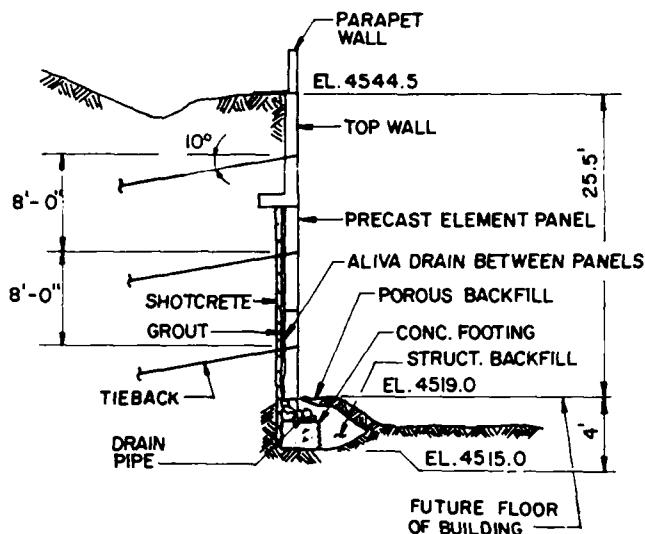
ELEMENT WALL CROSS SECTION, ROGERS PASS
